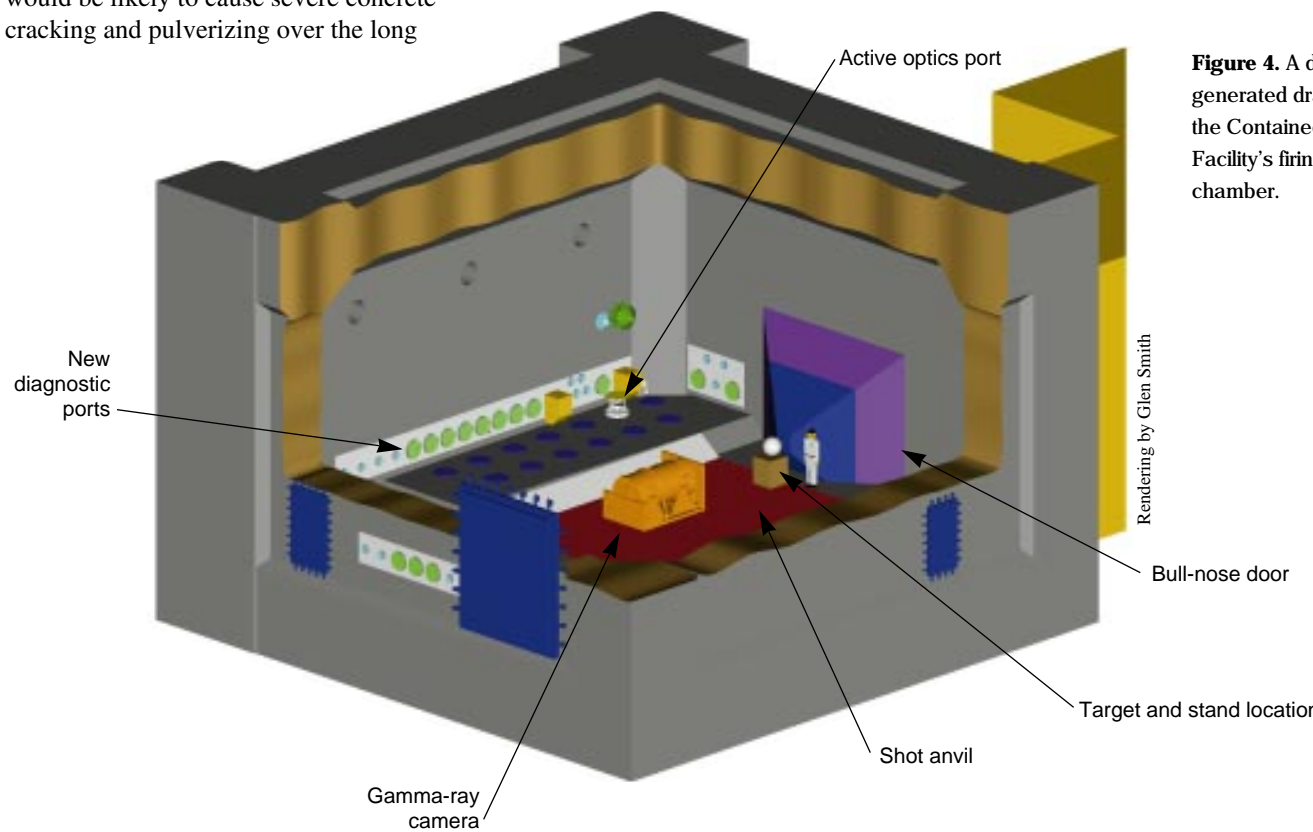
A design-generated drawing of the Contained Firing Facility's firing chamber.
